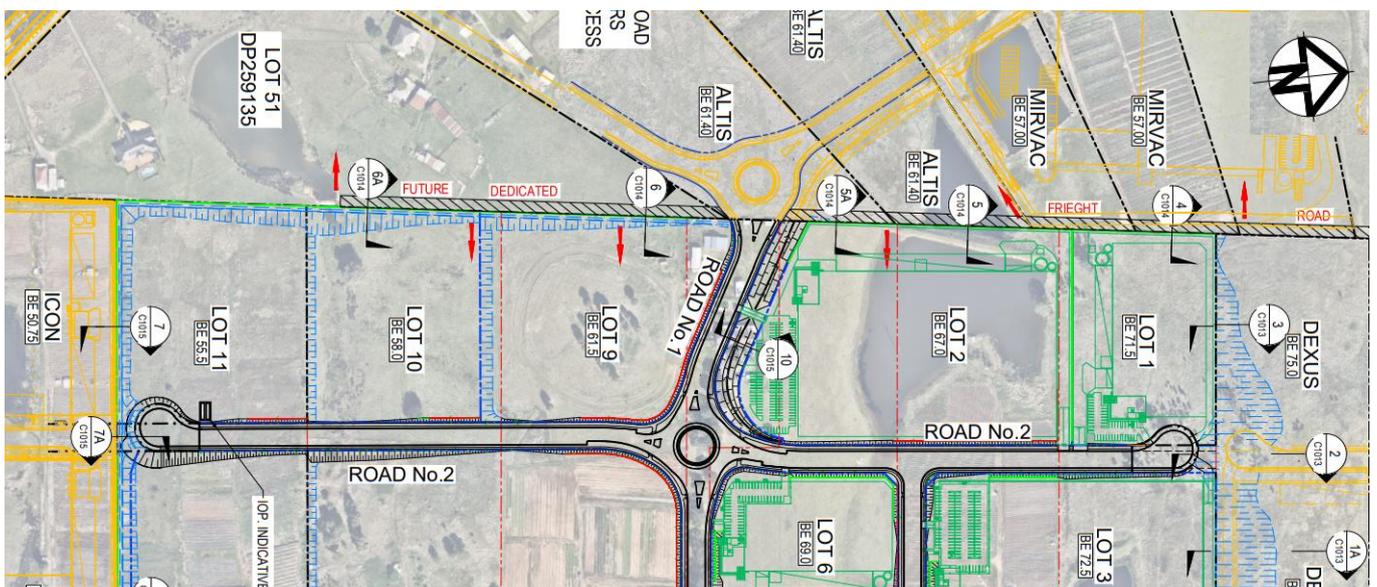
Collector Road (Road 1) and Aldington Road Intersection Roadworks Plan
